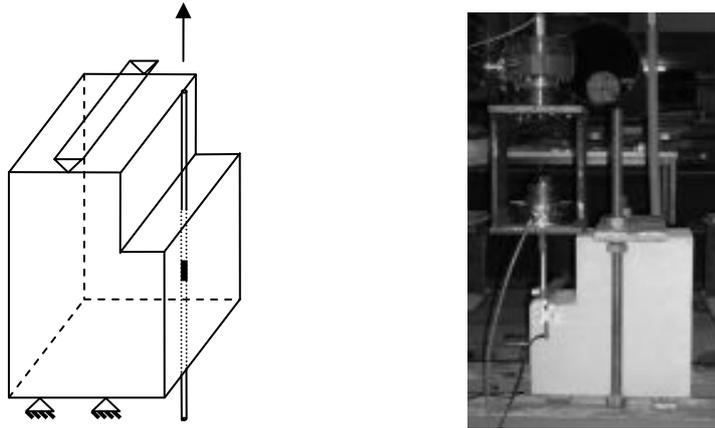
Geometry of the test specimens and test setup of the pull-out tests with short anchorage length
